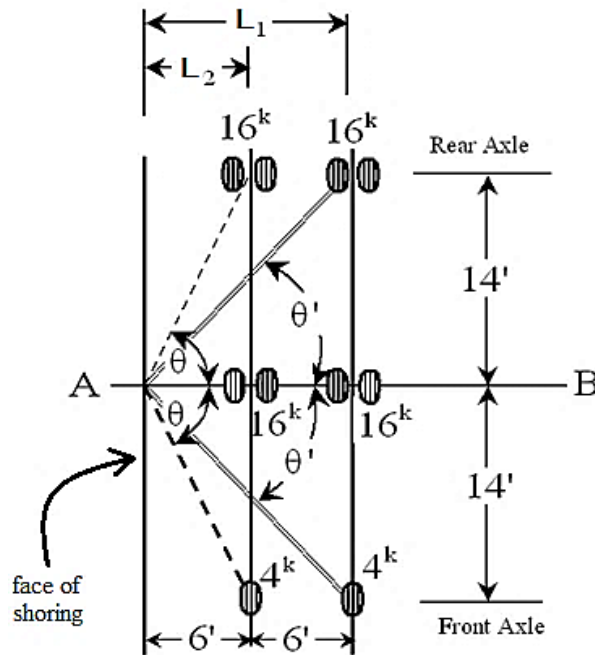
Example problem of HS-20 traffic loads adjacent to excavation
